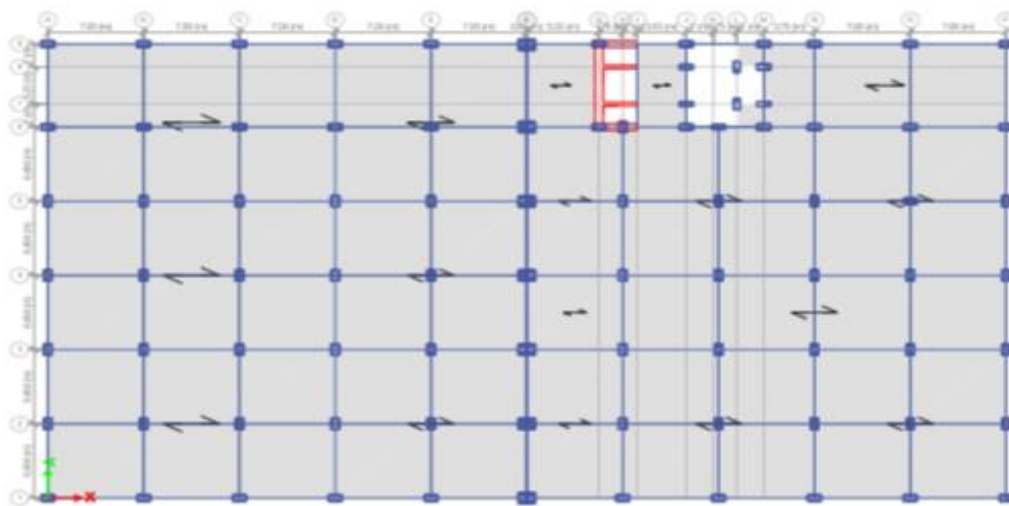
ETABS plan view showing the expansion joint at the building mid-length (35 m), separating the two independent blocks.
